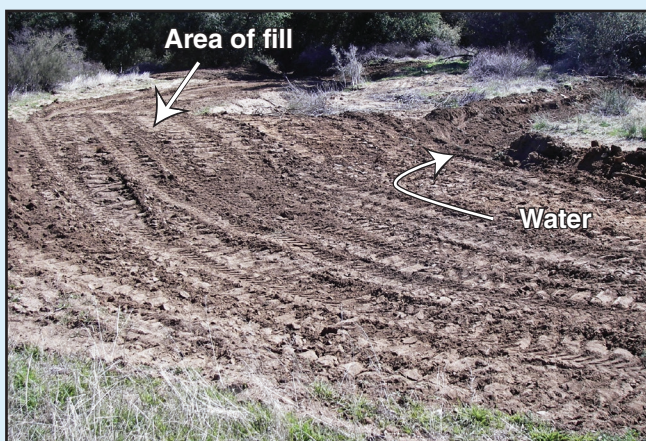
Rolling grade dips are constructed to direct water off existing trails.
